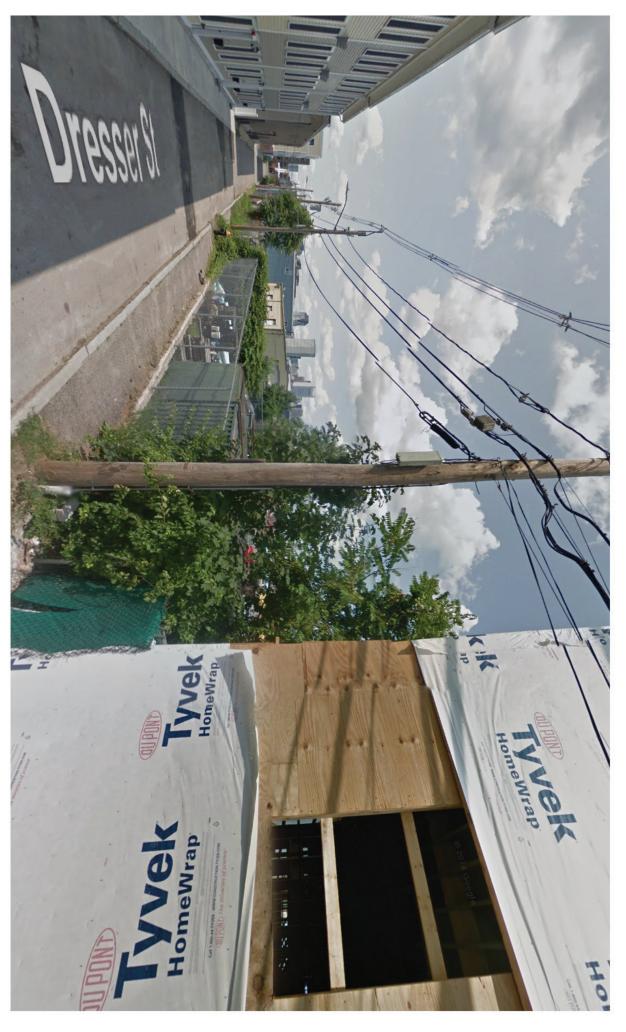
DRESSER STREET (FACING WEST)
